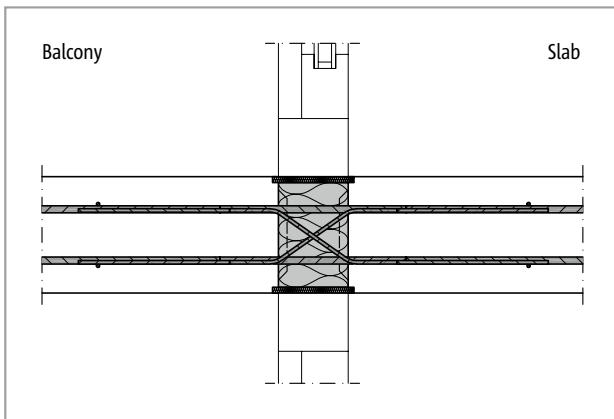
Schöck Isokorb® XT type D: One-way spanning
